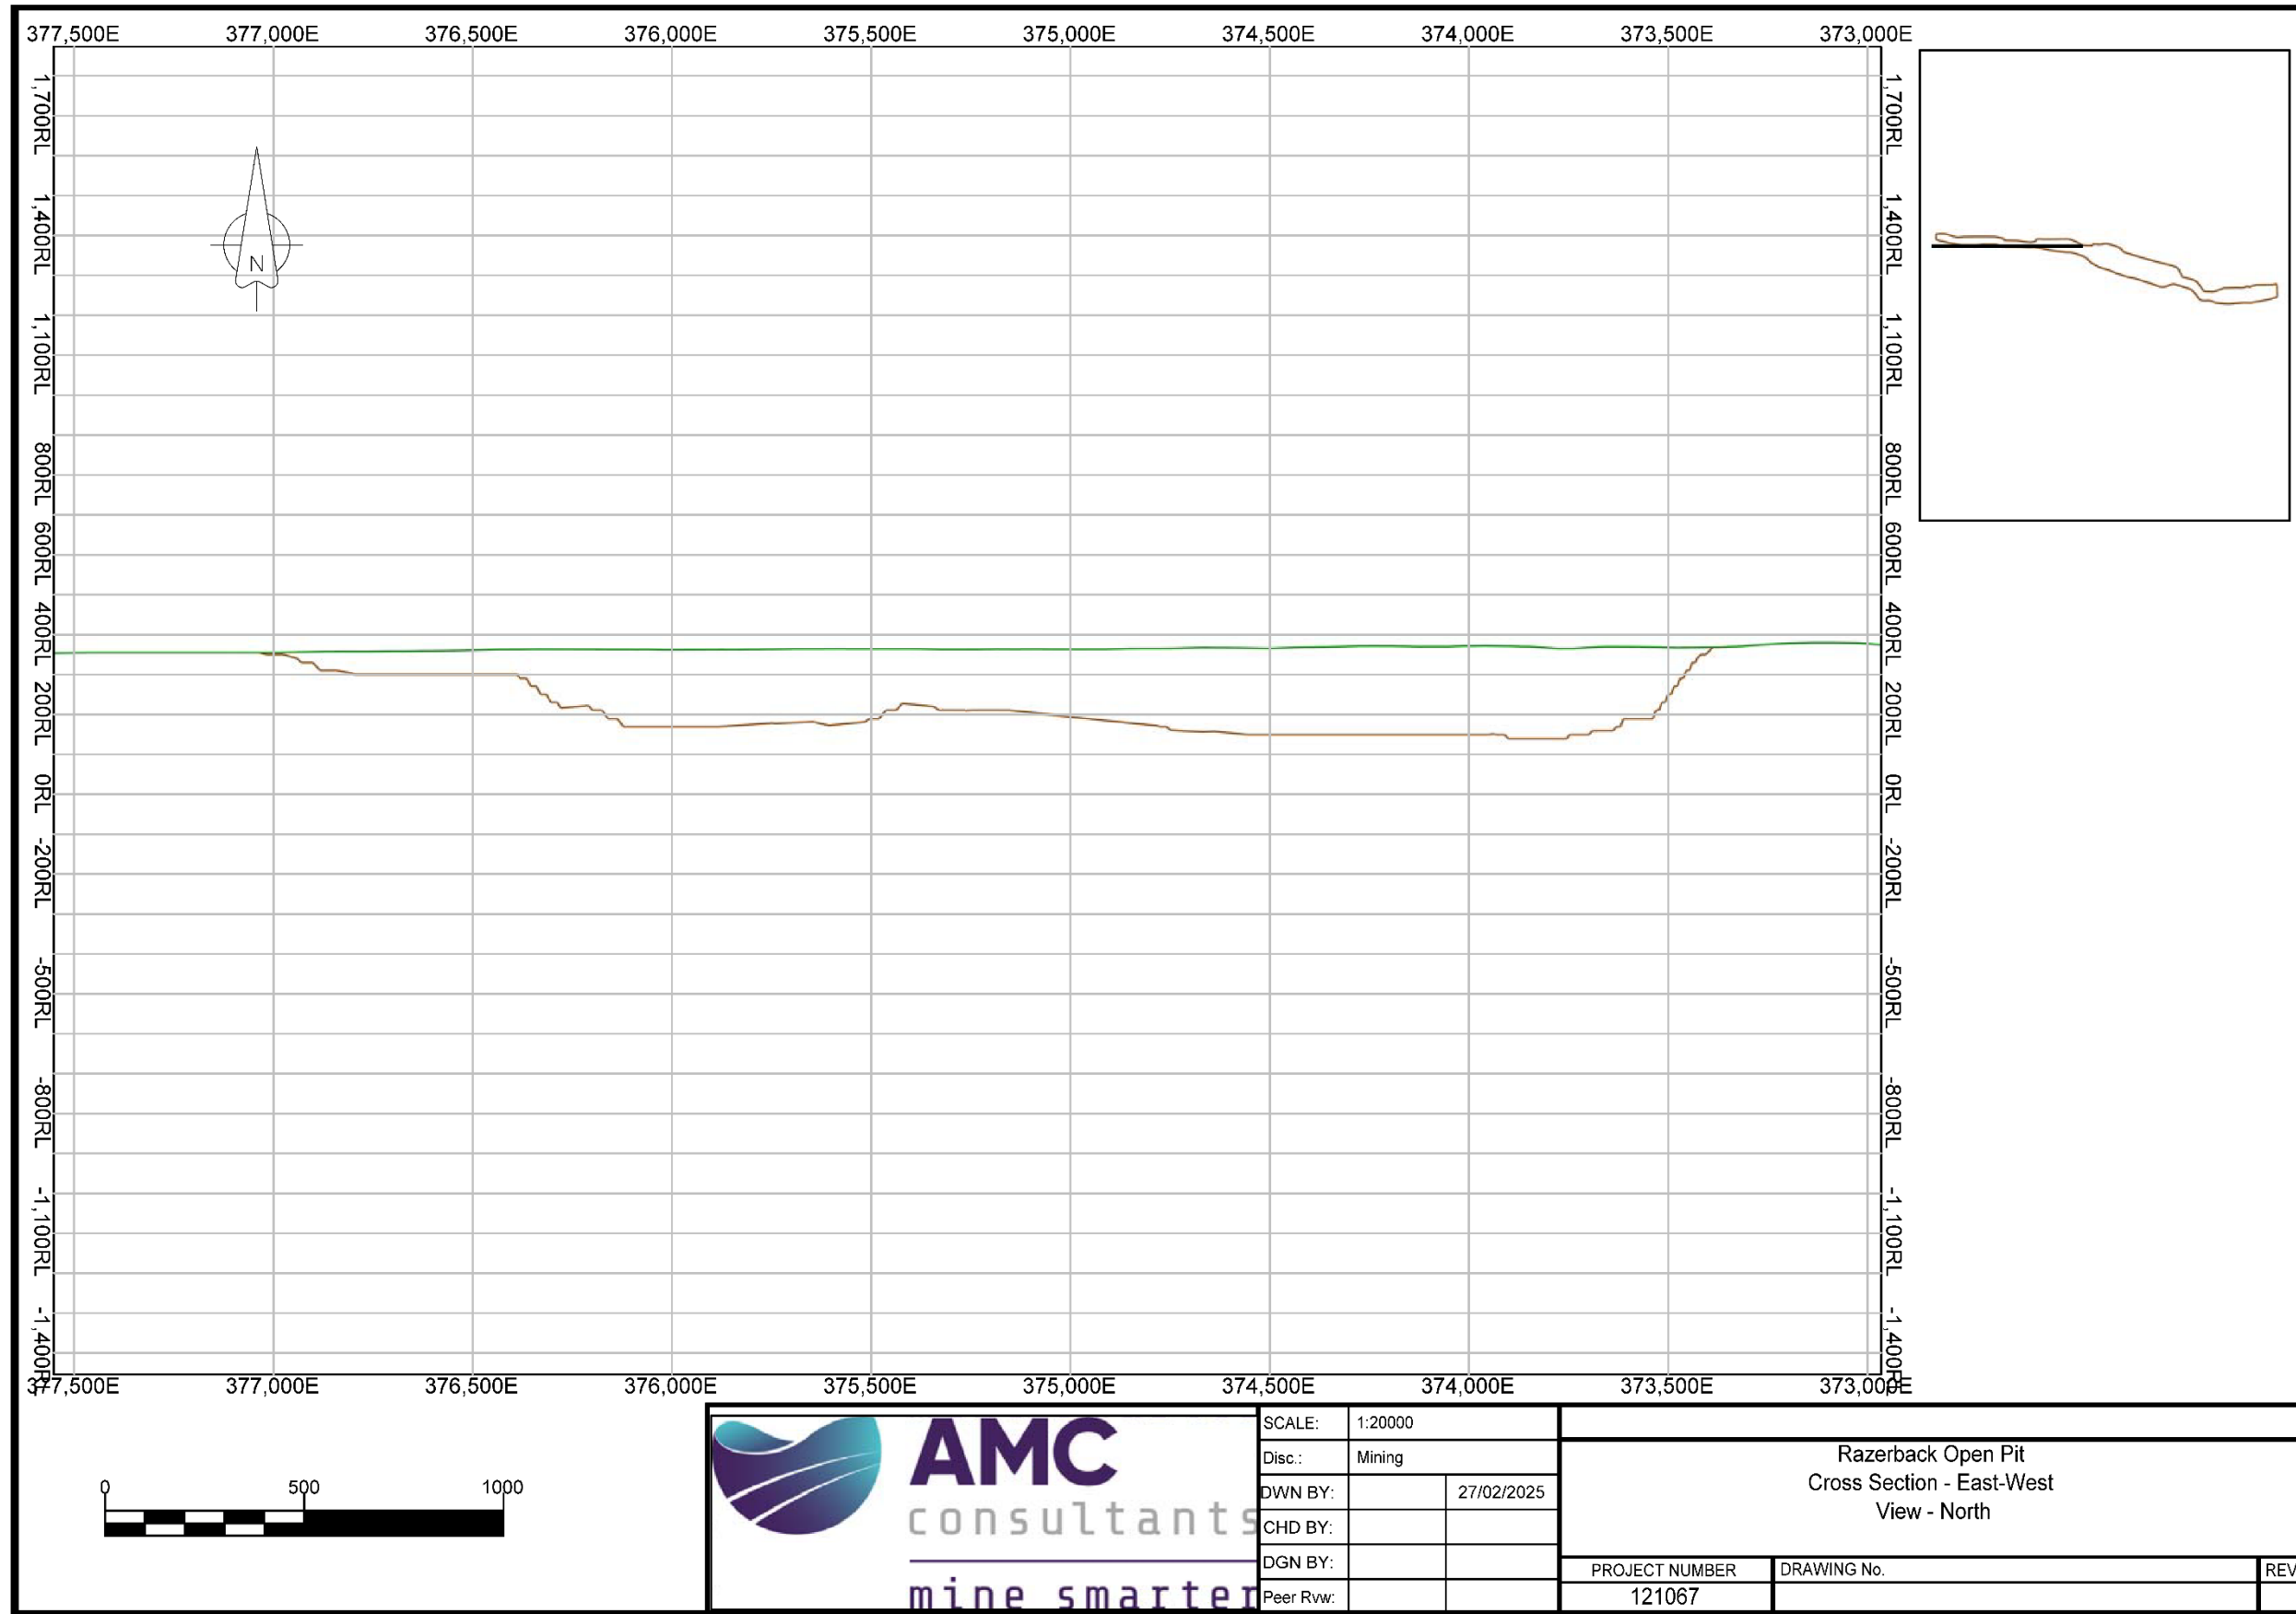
Razorback pit cross-section, east-west position (western sector)
